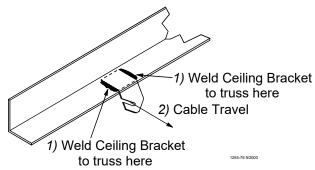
Welded Steel Truss Ceiling Bracket Installation
